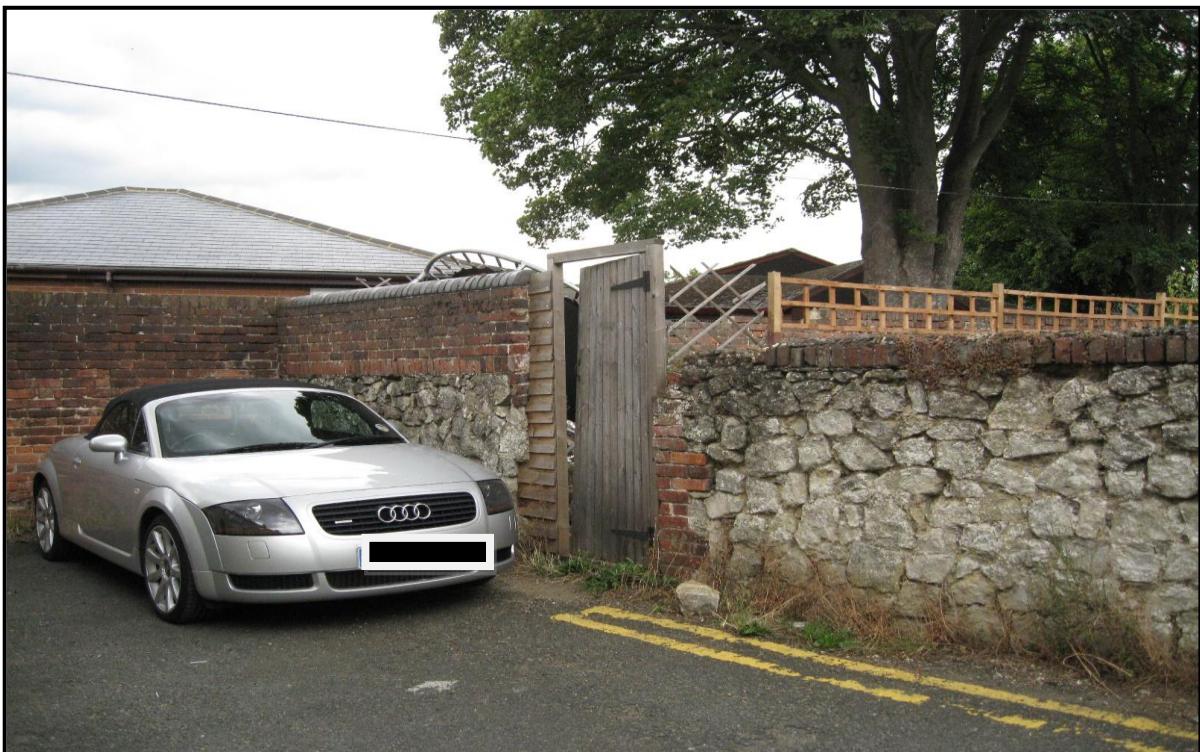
This photo shows the direct visual relationship between the wall to the rear of no 13 and the wall to the rear of no. 12.
